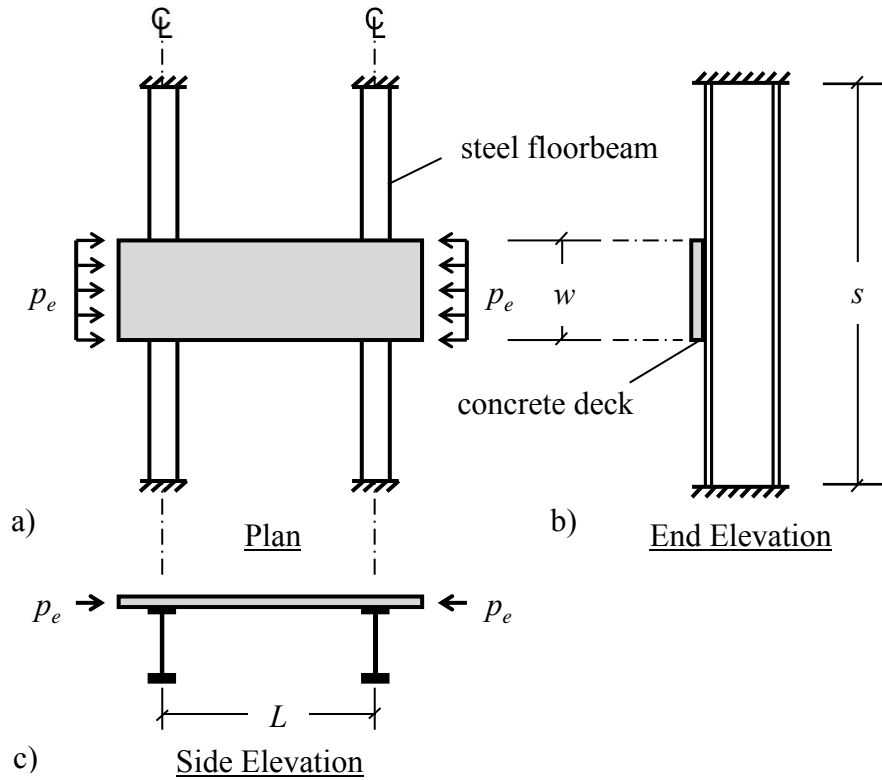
Concrete deck on steel floorbeams: a) plan; b) end elevation; and c) side elevation.
